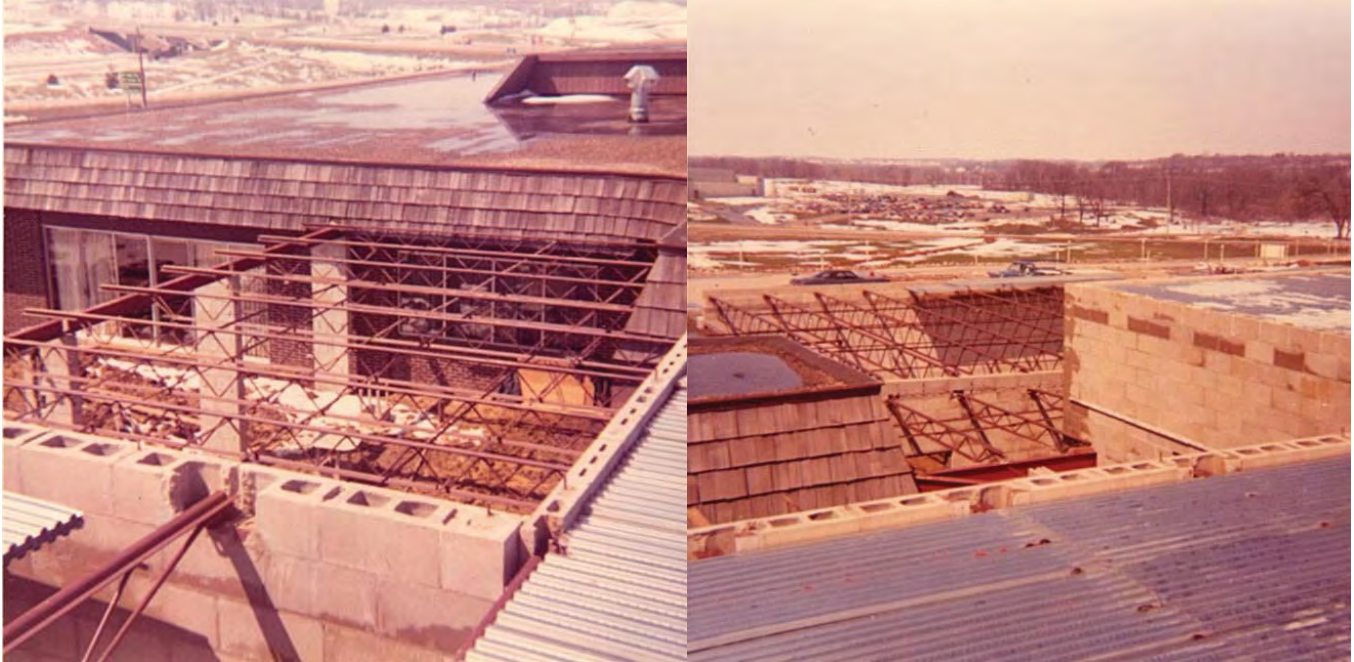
Construction photos, lower level of south motel wing decked, looking northeast, both December 1972 (Courtesy of Sheila Boyd)
